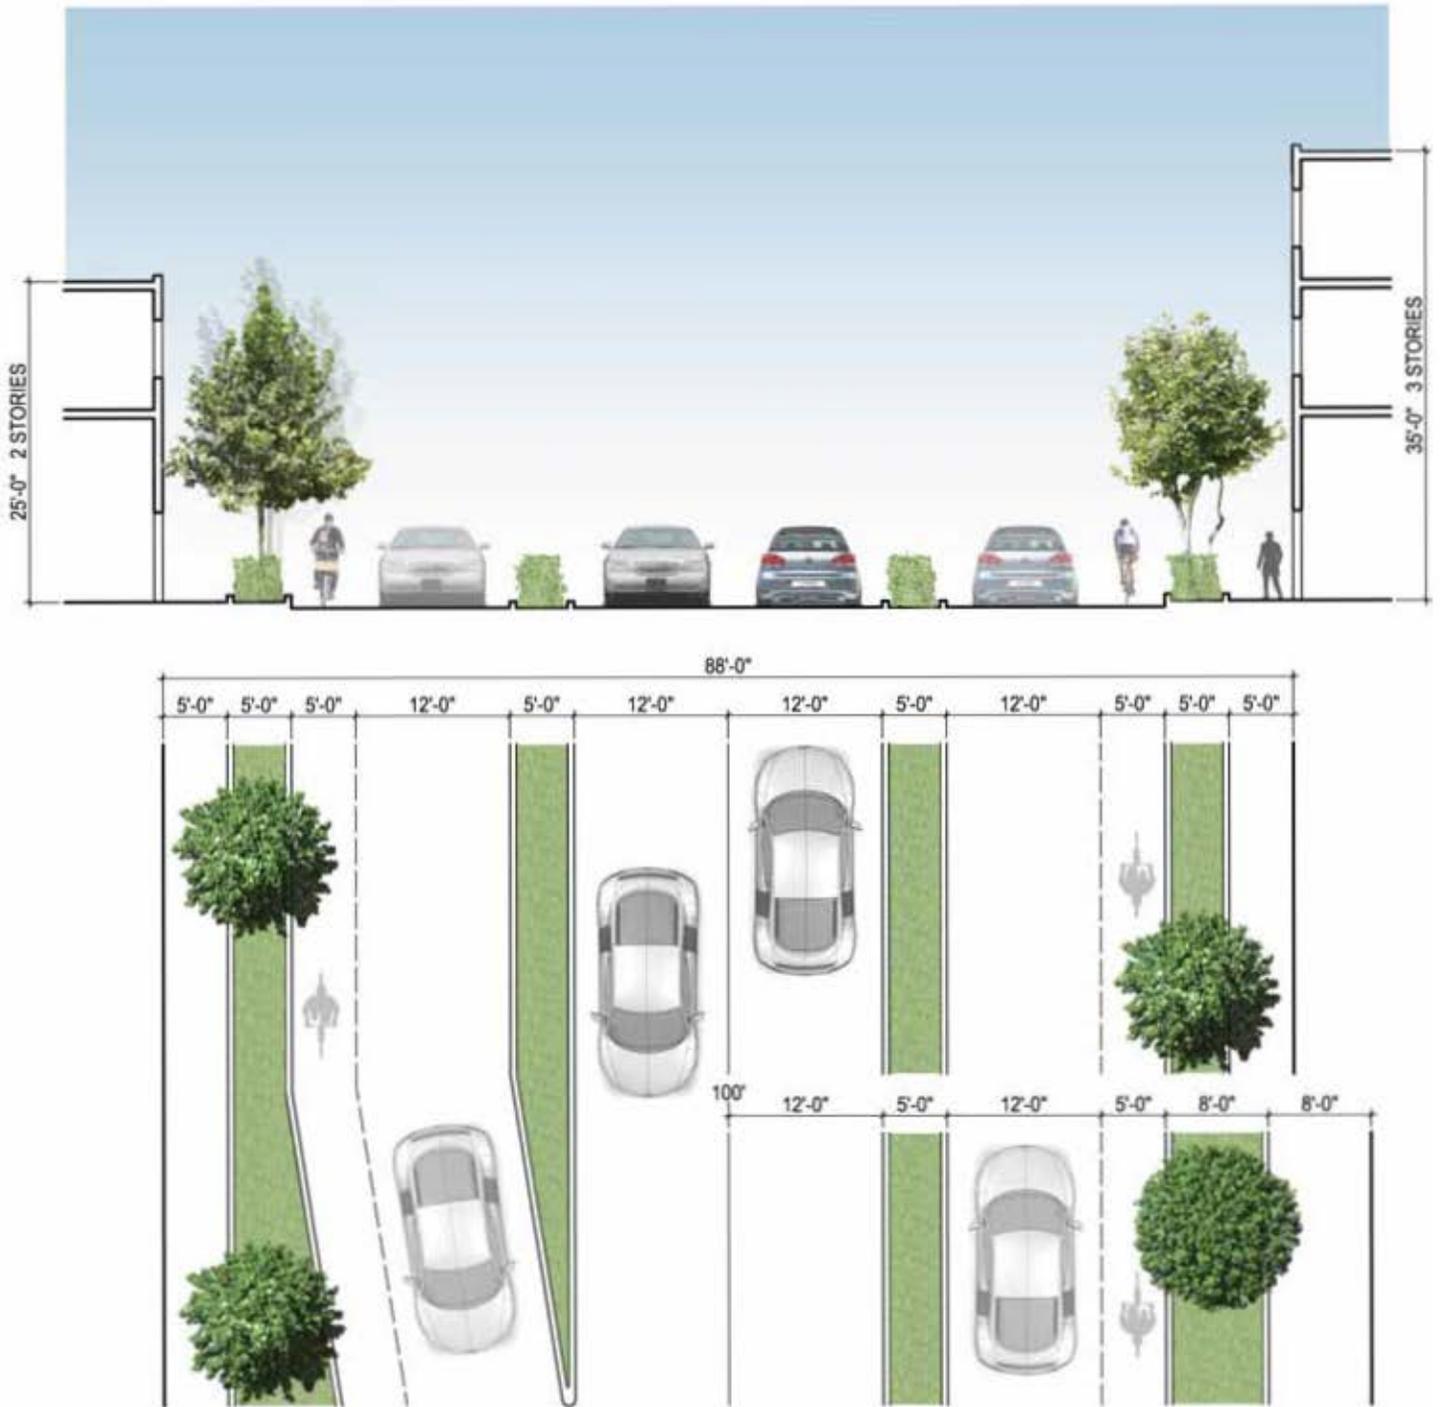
Street Plan and Section - Hallock Ave. to Rt 347 with through and local lanes and bicycle lane in planting strip 64
